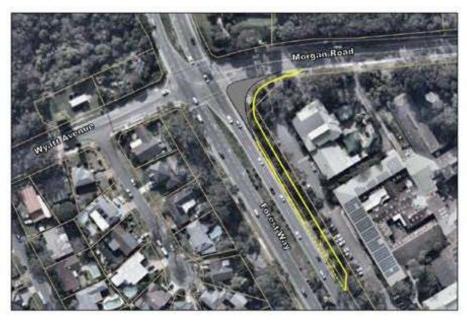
Proposed upgrade to Morgan Road / Forest Way intersection (Source: Gyde 2023 Planning Proposal)
